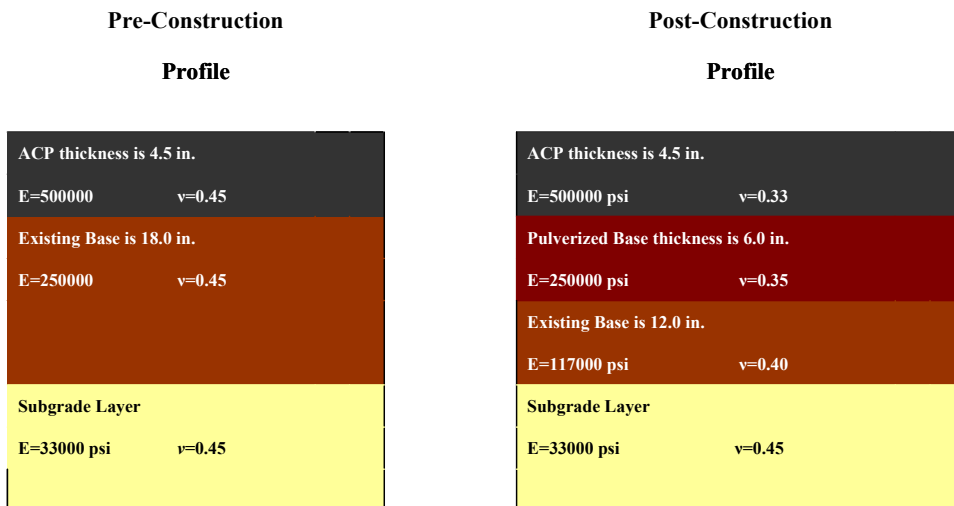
Pavement Cross-section Before and After Pulverization
